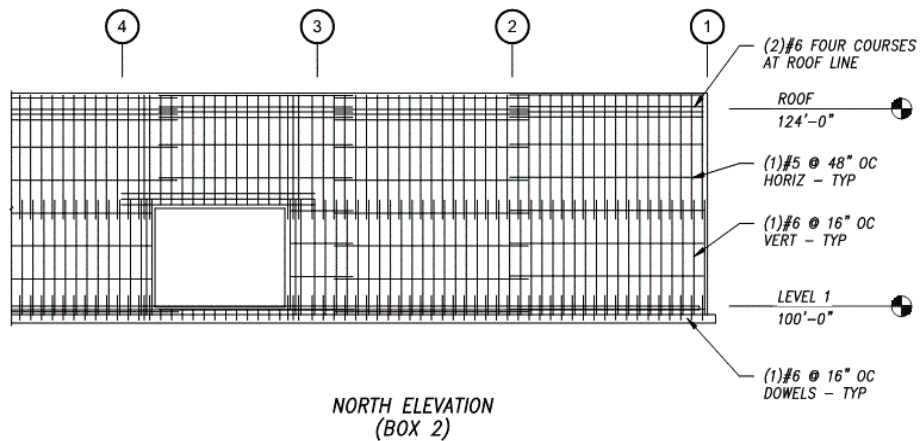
Single-story retail/industrial/warehouse building North elevation: BOX2.
